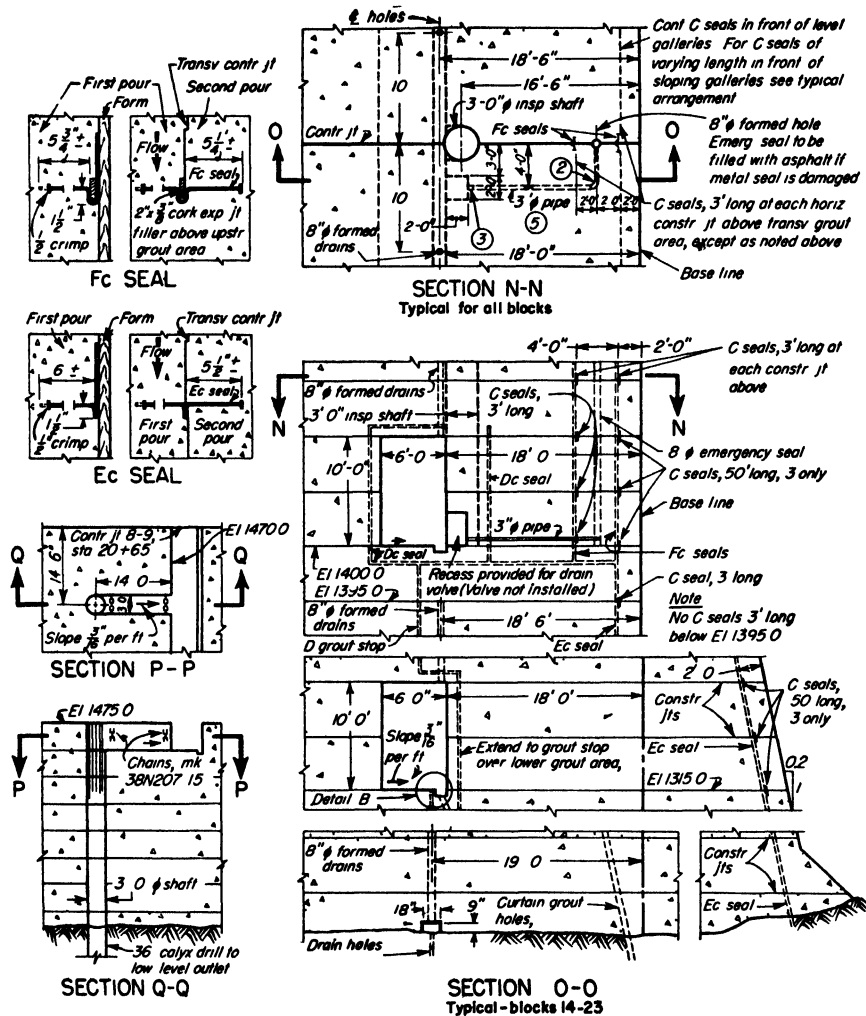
Fontana Dam—typical arrangement of drains, seals, and water stop.
